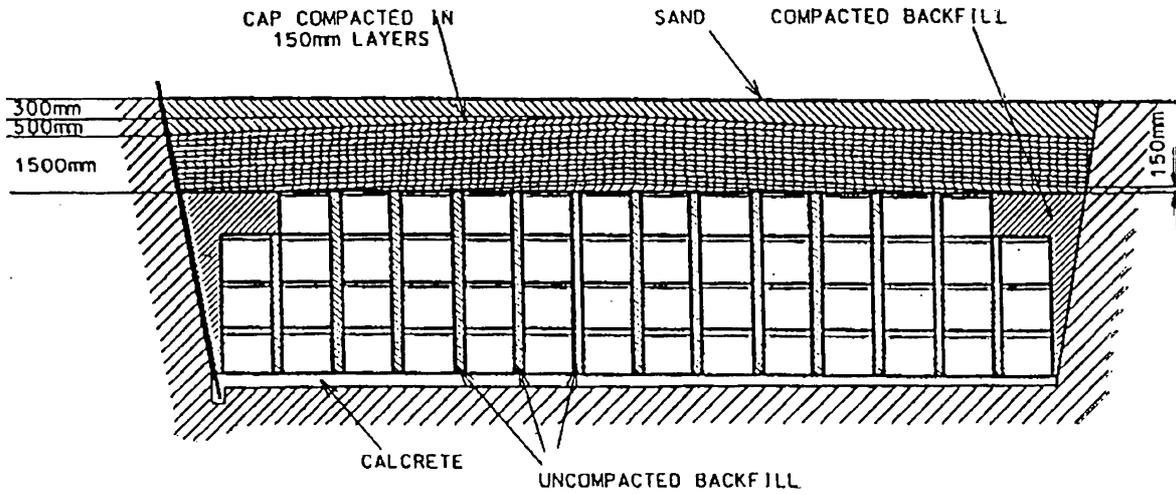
Detail of backfilling and cap construction (South Africa).
